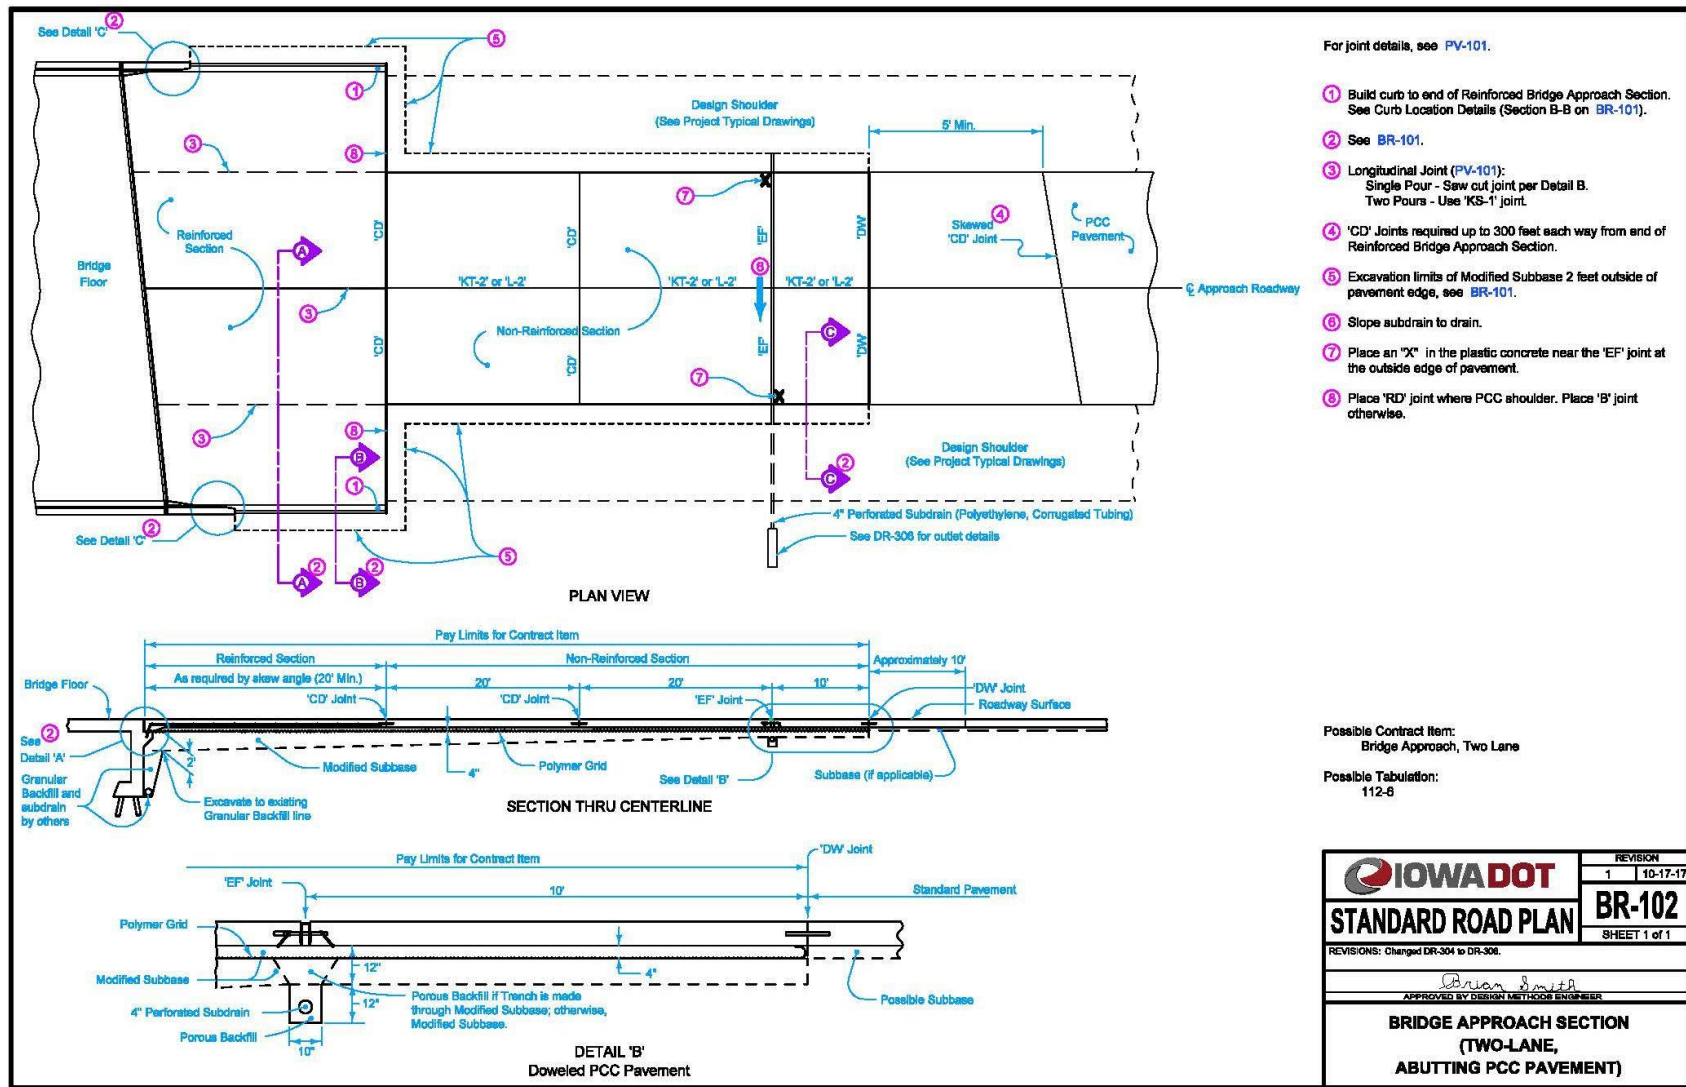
Iowa DOT Standard Road Plan BR-102 – Bridge Approach Section (Two-Lane, Abutting PCC Pavement) [68]
